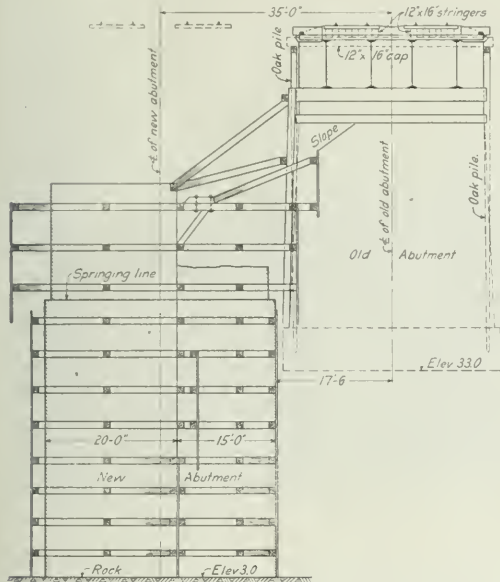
Method of Supporting Old Pier During the Construction of the New One.
